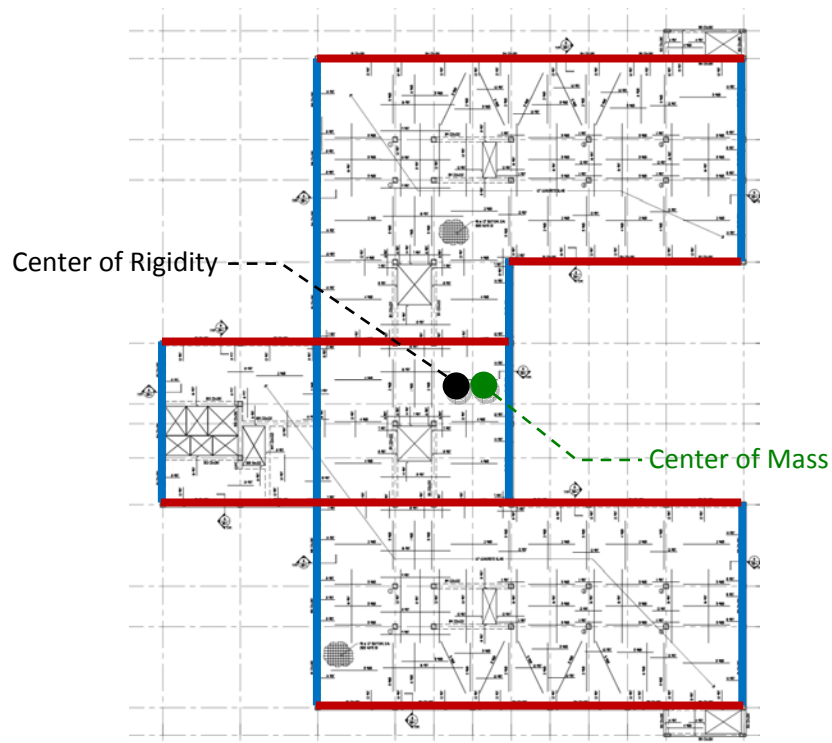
Modified Concrete Moment Frame Design; Center of Mass and Rigidity Level 5
